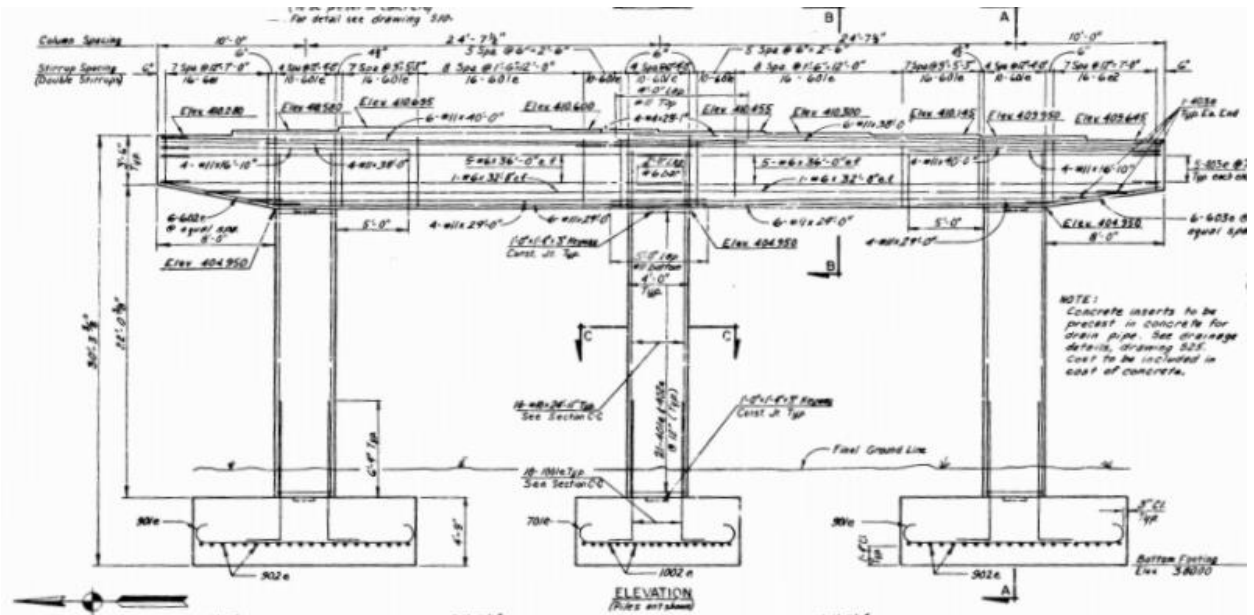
Transverse Elevation of Interior Pier (Pier 2 and 3) (NBI 21985) (1984)
